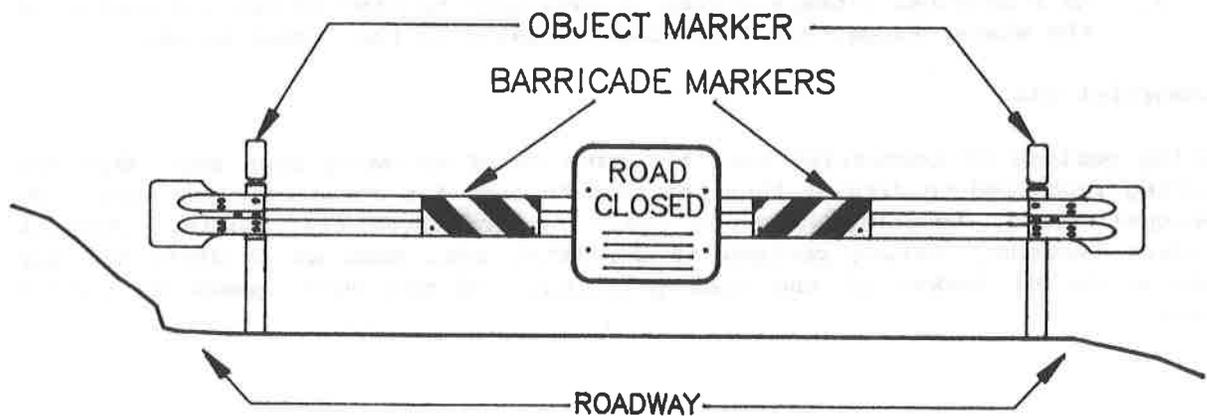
Sign and Guardrail Barricade Entrance Treatment
